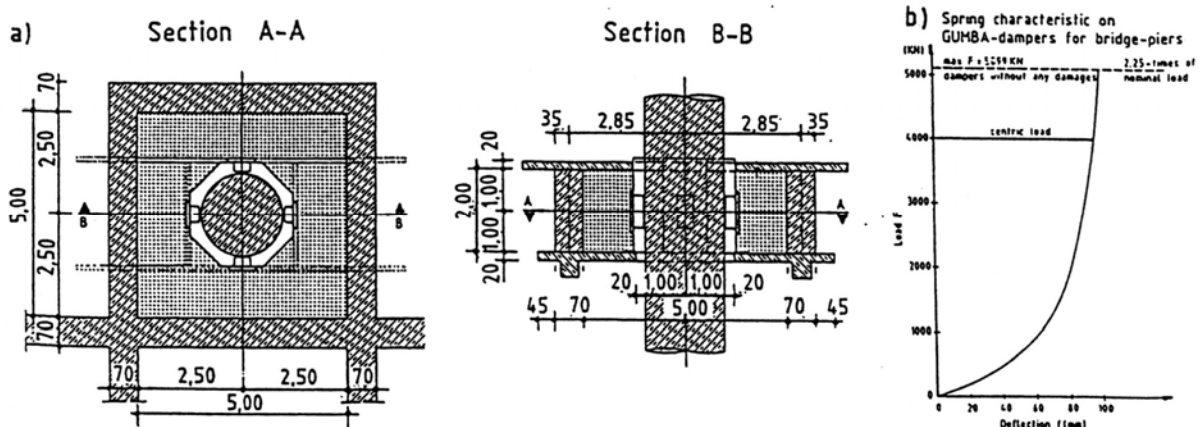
Bearings at -32 m; a) Layout, b) Load-Displacement Diagram
